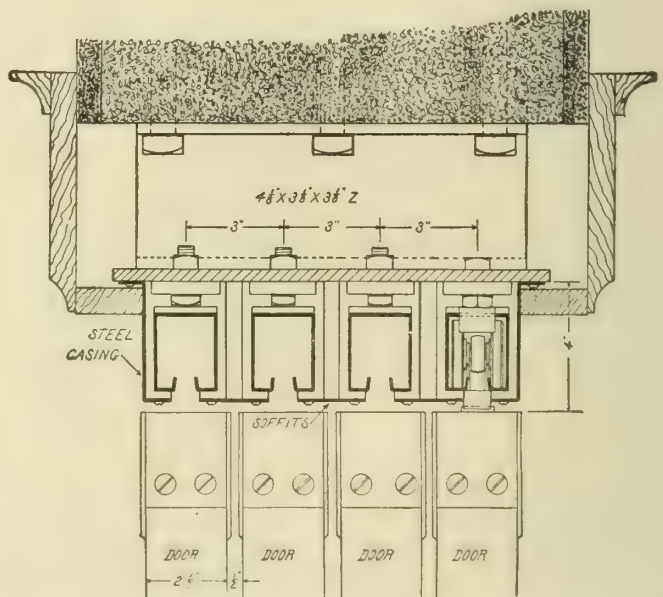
NO. 444 CROSS-SECTION, FLUSH DOOR HANGER
